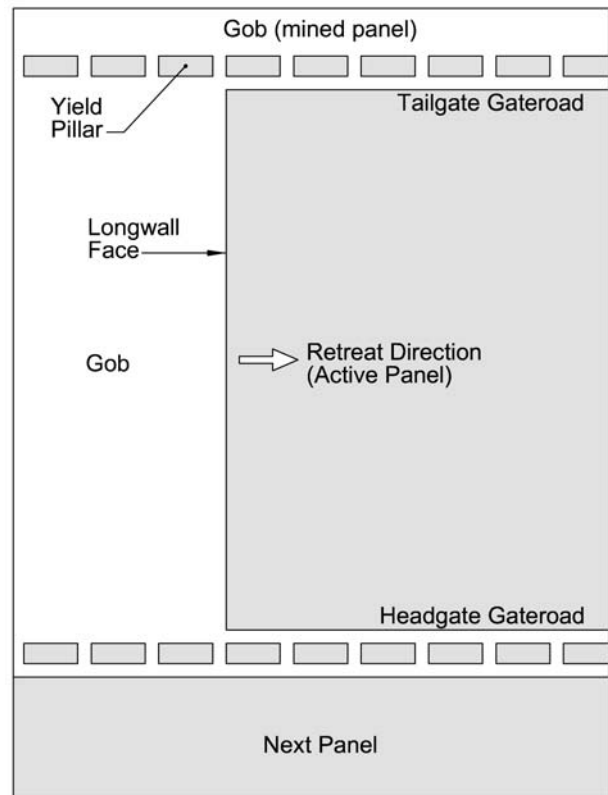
Plan of Two-entry Yield Pillar Gateroad System with Side-by-side Longwall Panels
